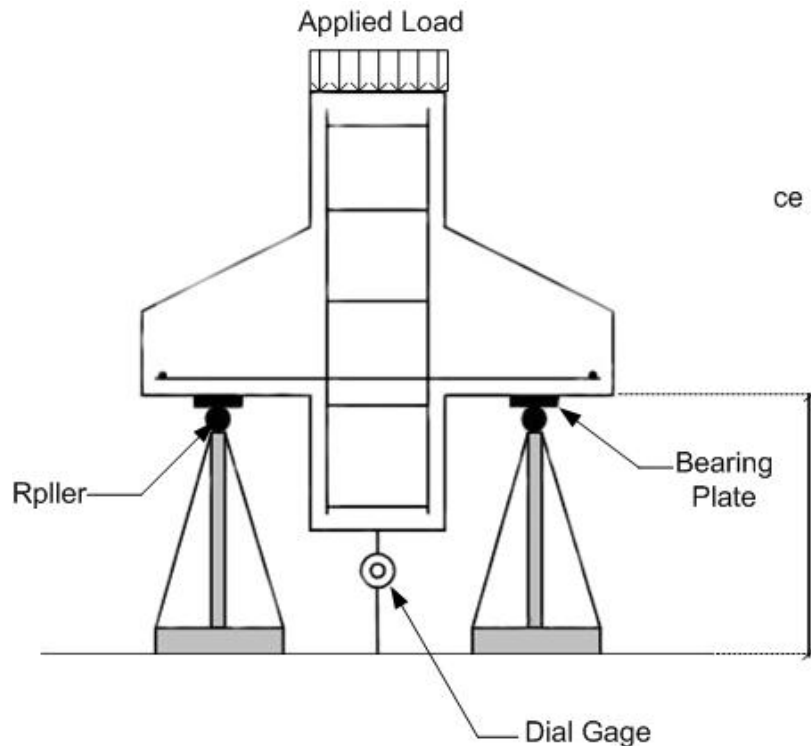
Loading arrangement with measurement instrumentations on corbels.
